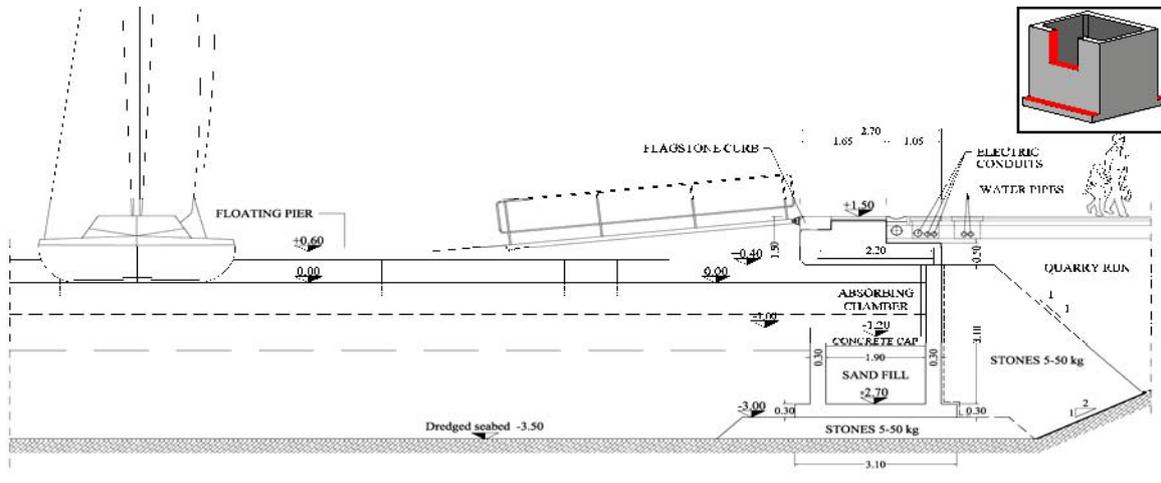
Typical section of the perforated caisson quay wall and floating pier
